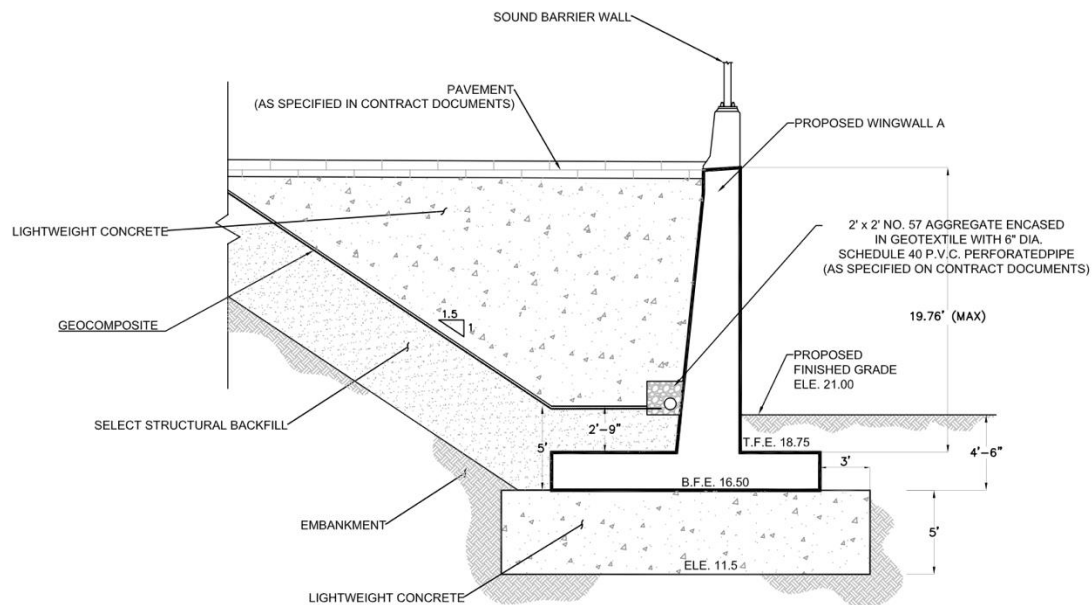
Typical cross section for Wingwall A (0095 Over Shackamaxon Street, S-26064).
